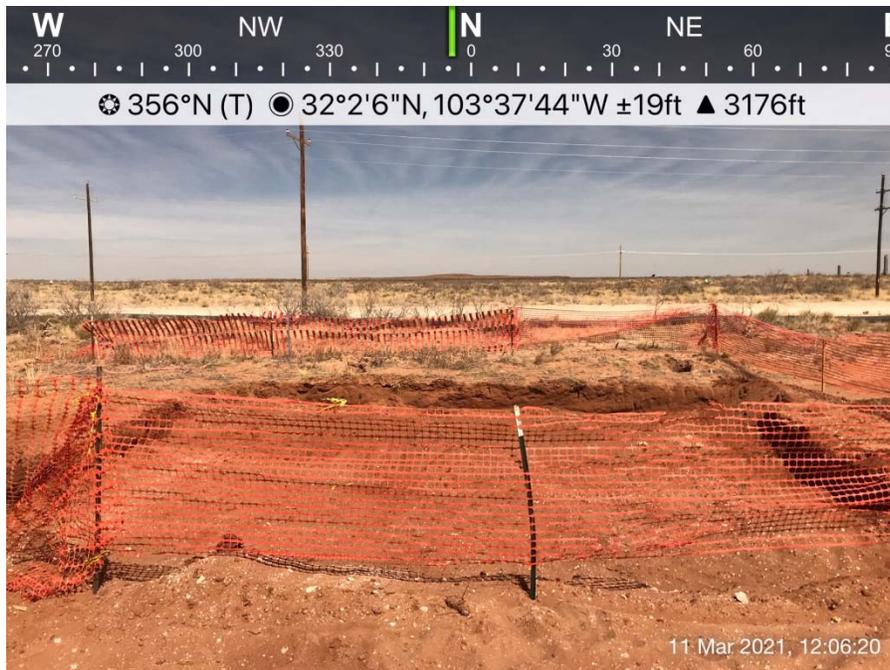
Photograph of Area 1, excavated to 1-foot bgs, March 11, 2021.
